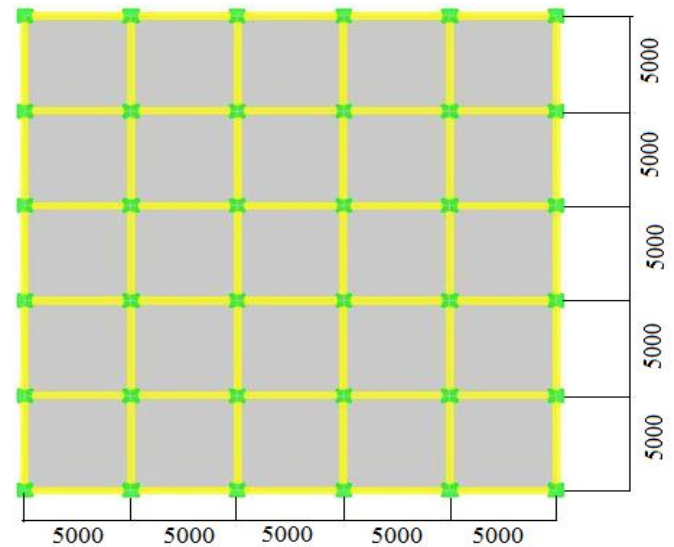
Typical plan of 5, 10 and 20 storey models considered for study (Dimensions in mm)
